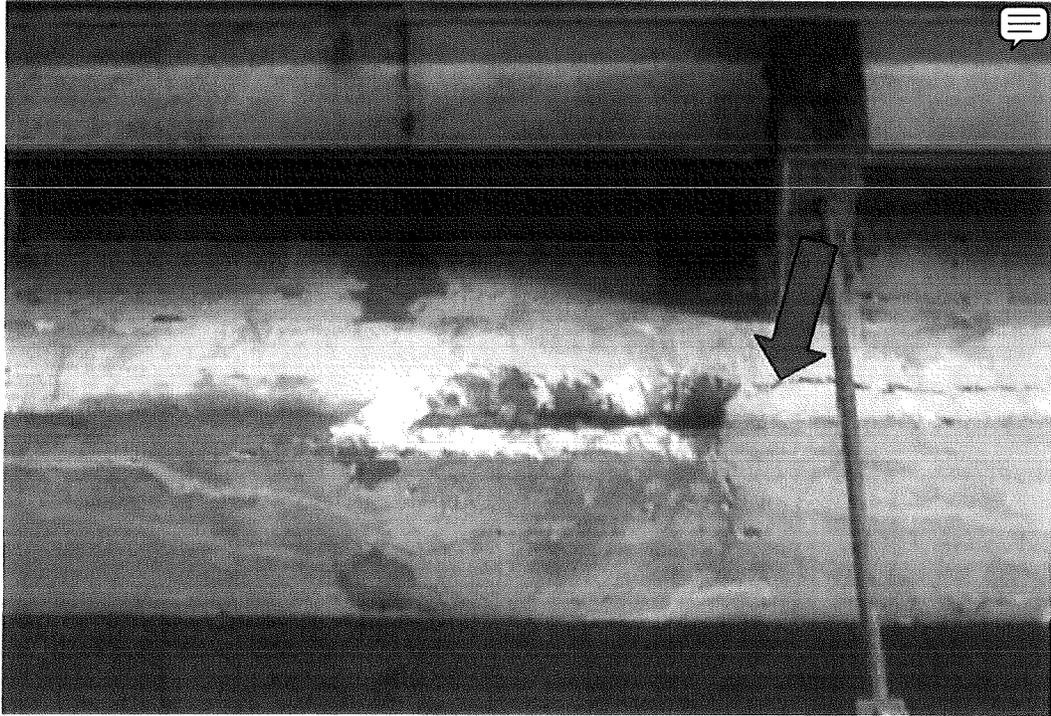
Cracked and hollow sounding concrete encasement. Underside of parking Level 6, between Column Lines U5 & U6, along Column Line 23. (Approx. 4 SF)
